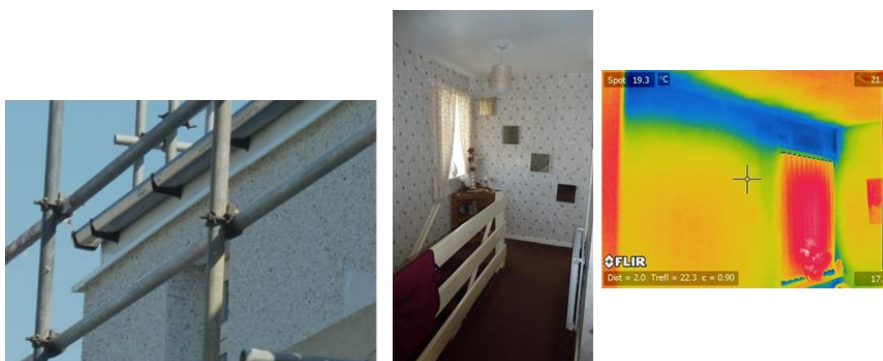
Thermal imaging for thermal break at top floor wall/ceiling junction for a 1970s no-fines end terrace
